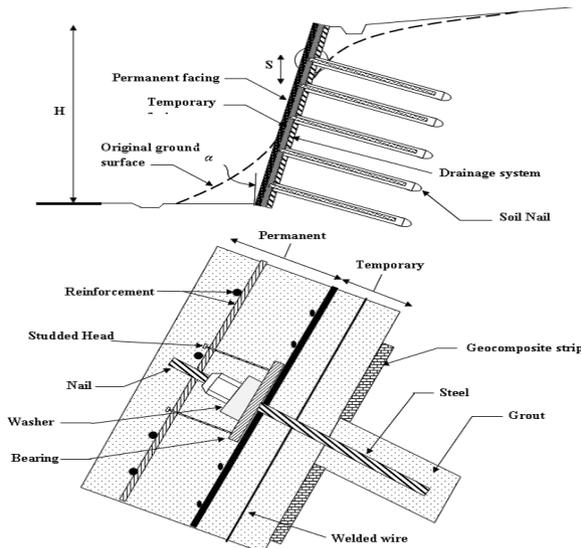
Typical cross-section of a drilled soil nail wall (Byrne *et al.*, 1998)
